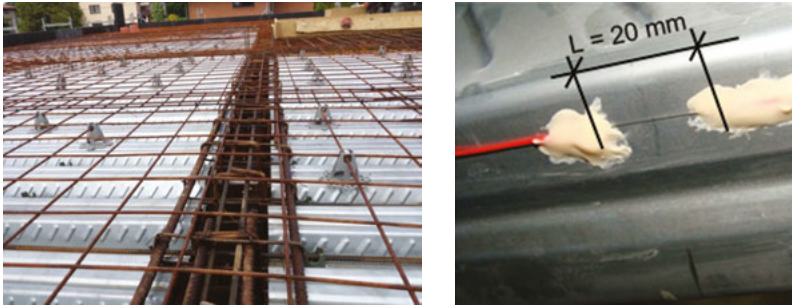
Composite floor slab at the construction stage – location of the FBG sensor installation on the slab bottom part
